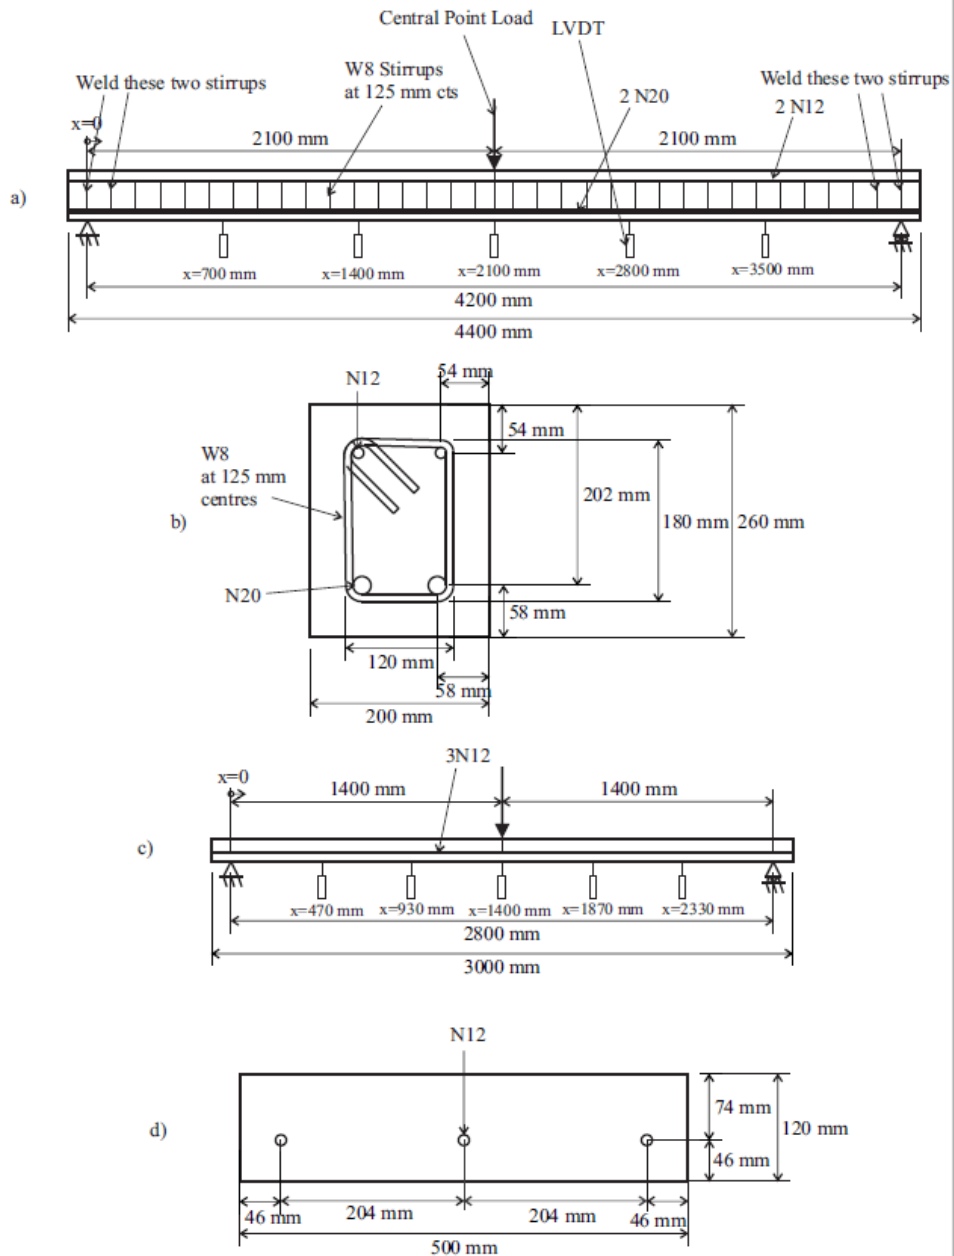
Test specimens: a) elevation of beam section; b) cross-section of beam section; c) elevation of slab section; d) cross-section of slab section
